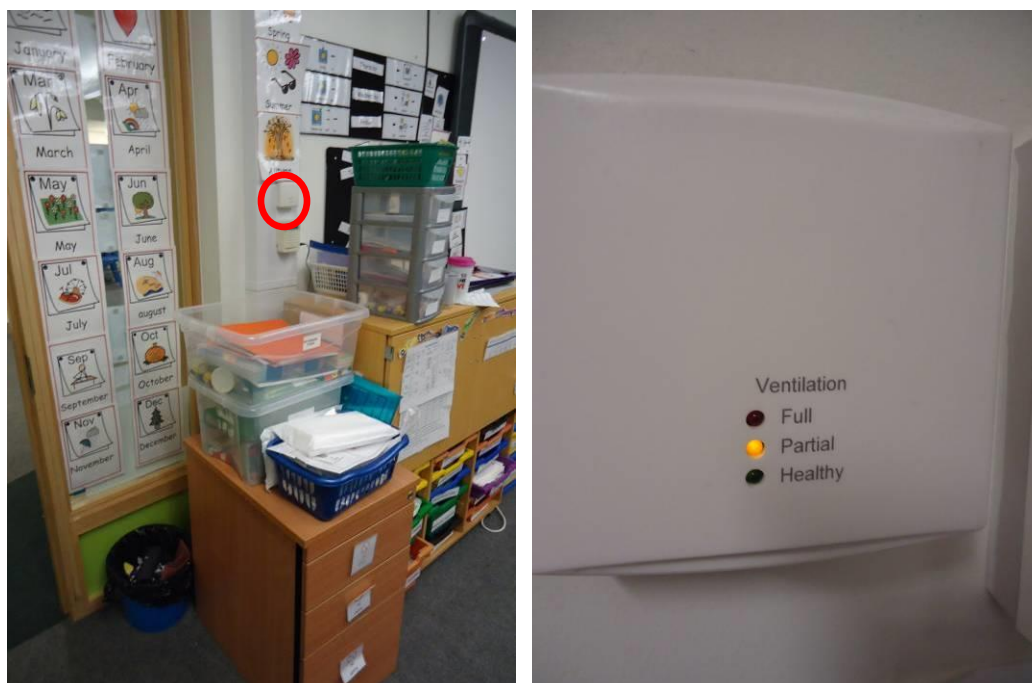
CO₂ sensor on wall in room C130 Cann Bridge block highlighted in red and close up. Note that its design does not make it stand out on a crowded wall.
